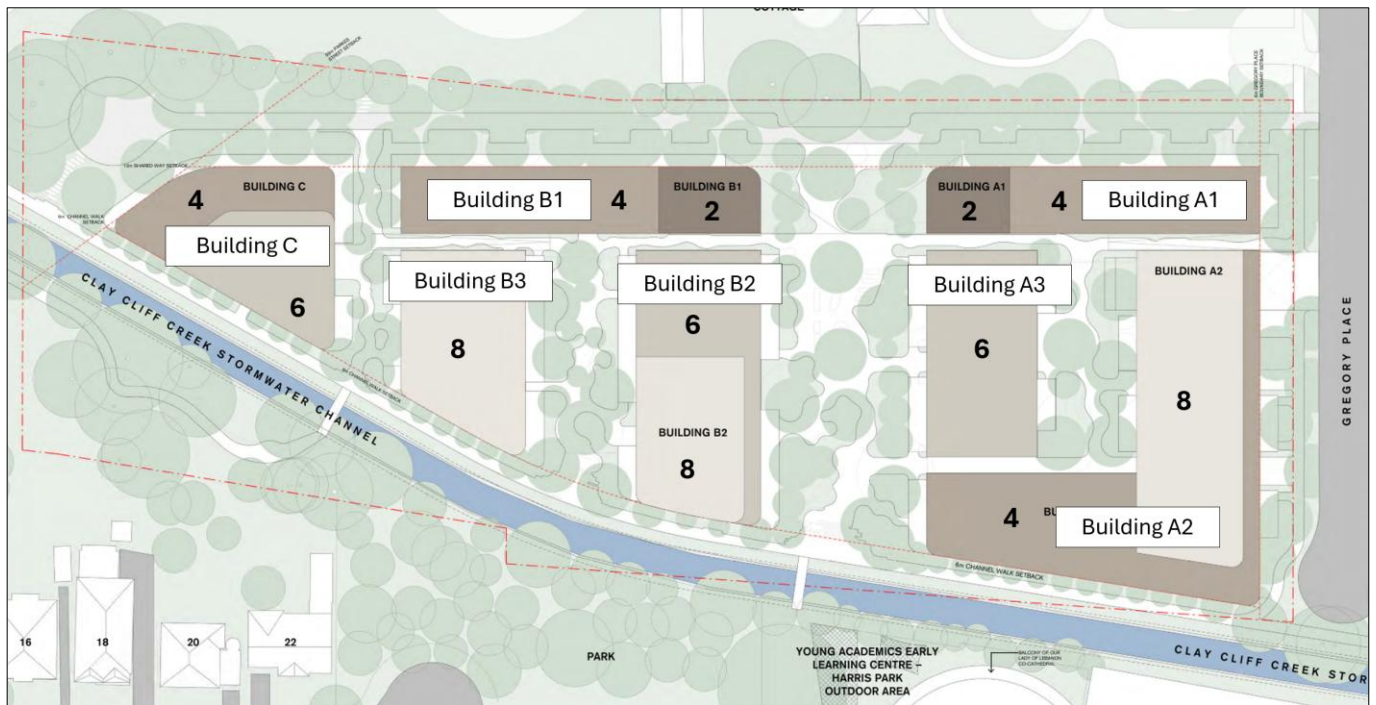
| Concept Envelope – Site Plan, with number of storeys labelled (Source: Applicant’s Amendment Report)
